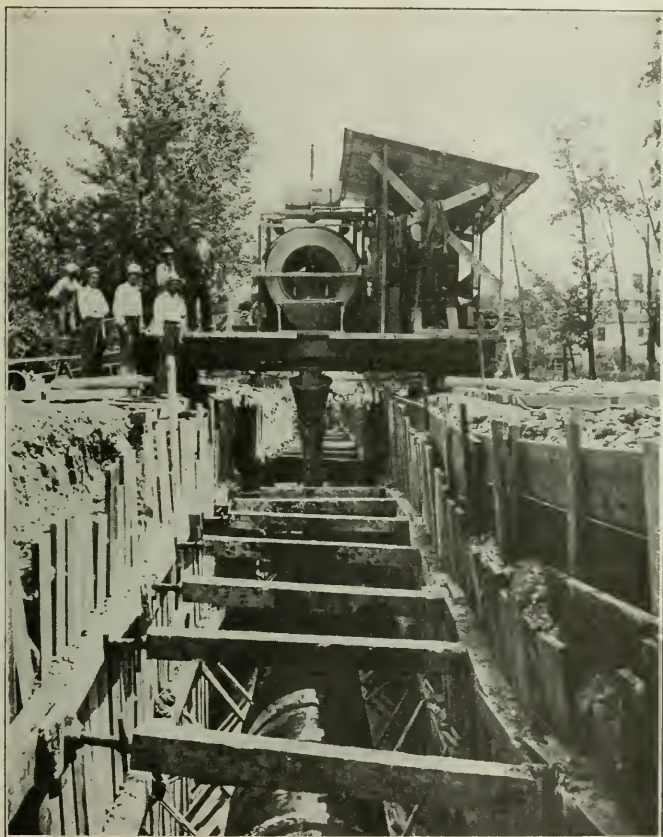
North Shore Sewer. Concrete Mixer Astride Trench, 6 ft. by 9 ft. Sewer, Sheridan Road—Contract No. 1.
